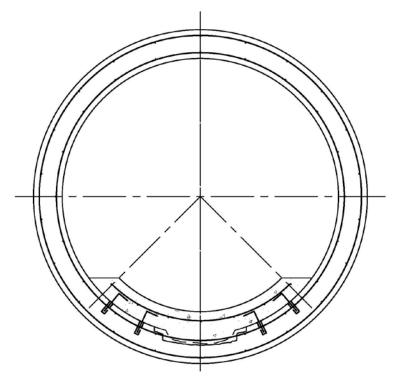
Typical RCP Paved Invert Detail (CNA Consulting Engineers, 2013)
